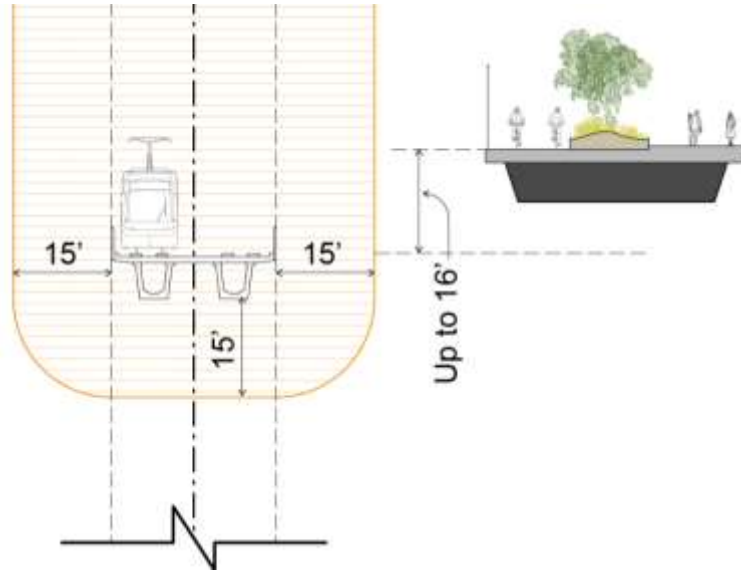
Section showing potential bridge location and required gateway setbacks west of I-405.
